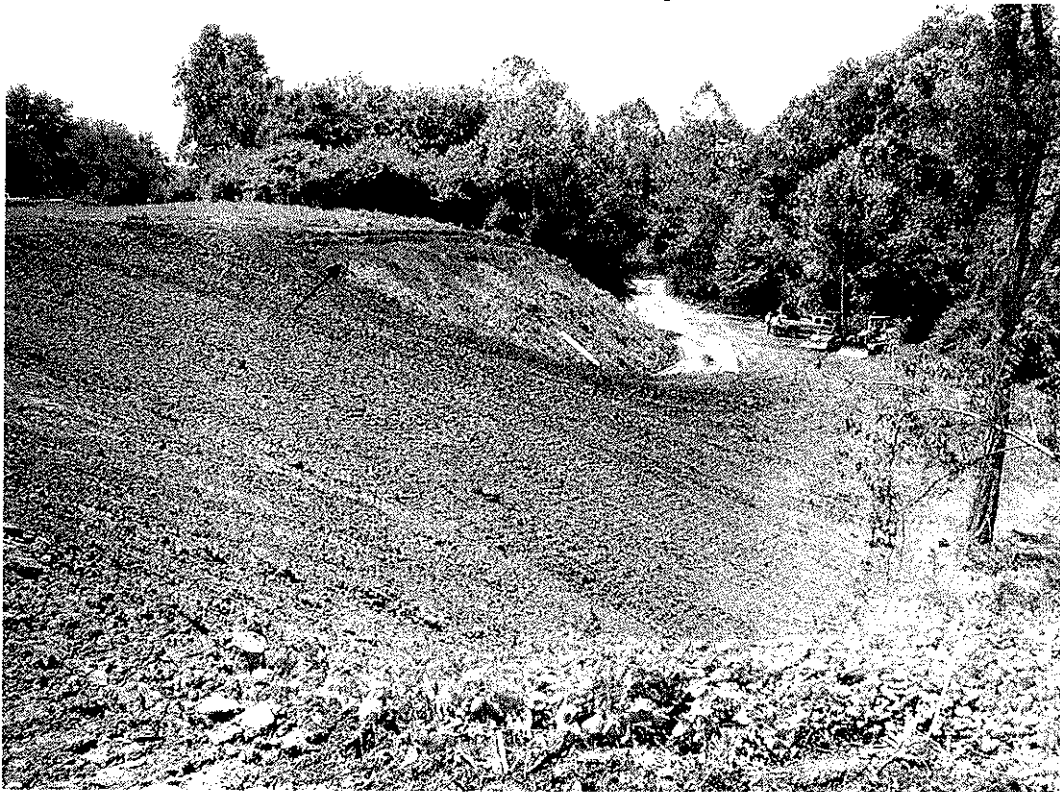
View of cover placement activities from the southeast facing northwest. Arrow points to keyway.
